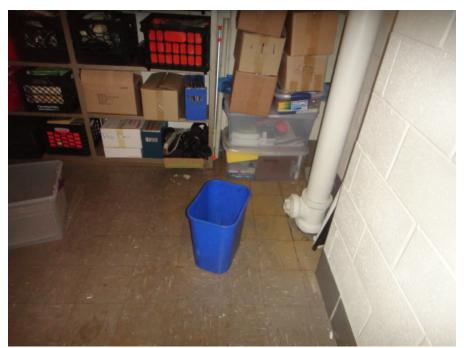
Reading Intervention Room A delaminated section of 9"x9" floor tile was noted.
